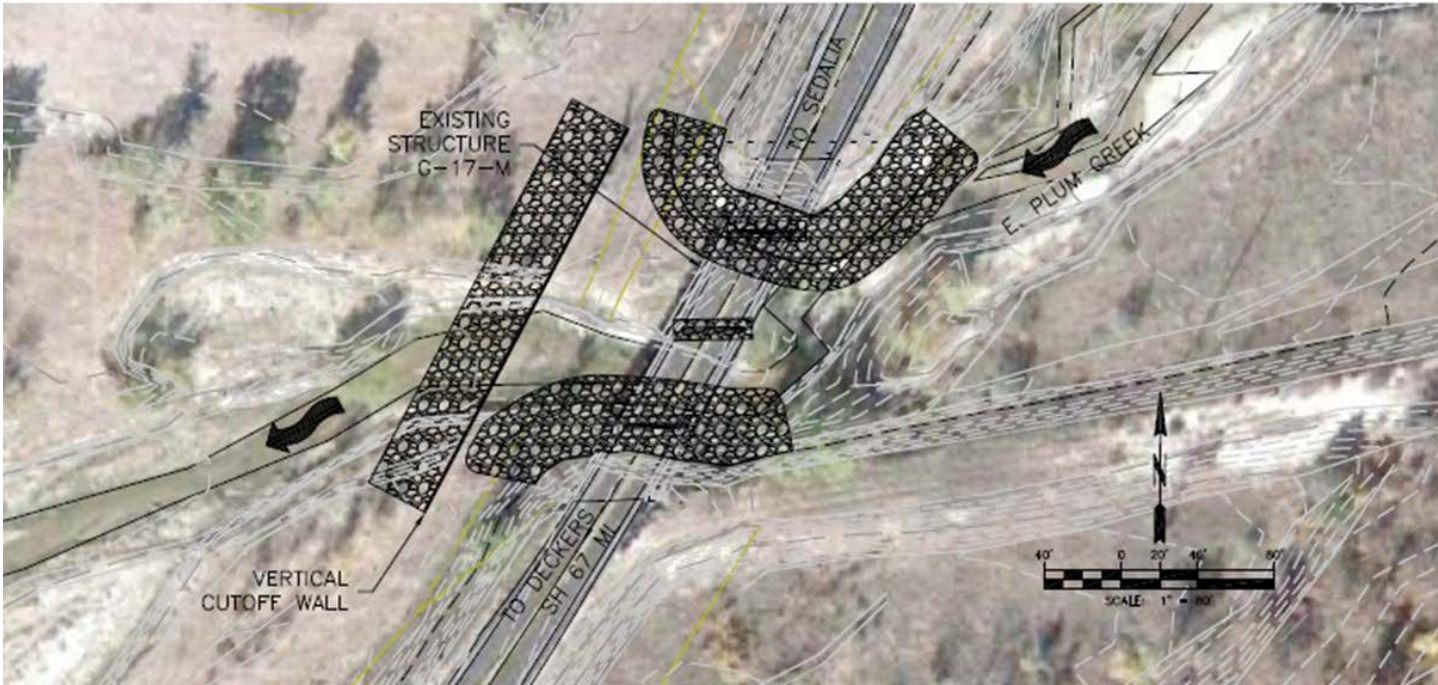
Plan view of Bridge G-17-M with recommended hydraulic scour countermeasure locations
